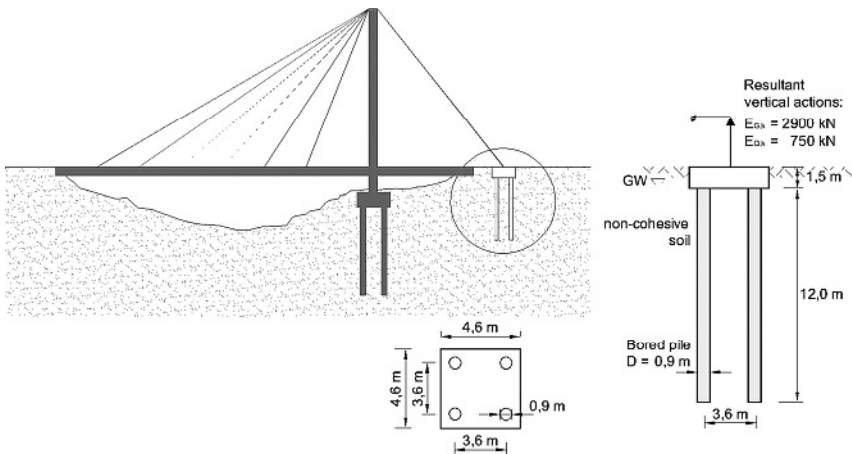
a) Suspension bridge, b) suspension cable anchored to a pile foundation, c) plan view
